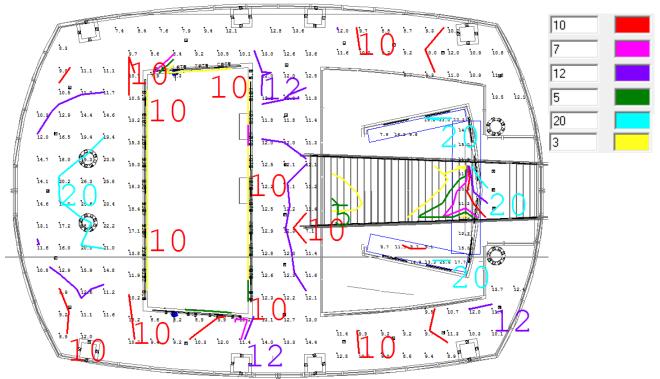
Lobby Floor Plan Isometric Contour Lines
